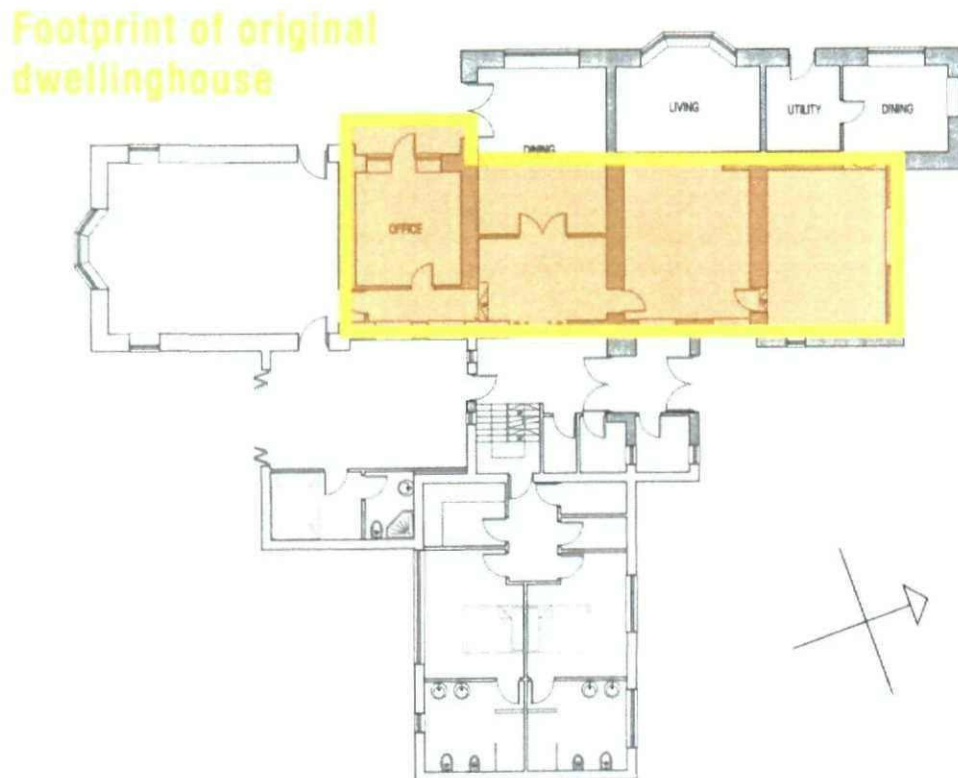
Footprint of "original" dwellinghouse overlaid over existing ground floor plan
